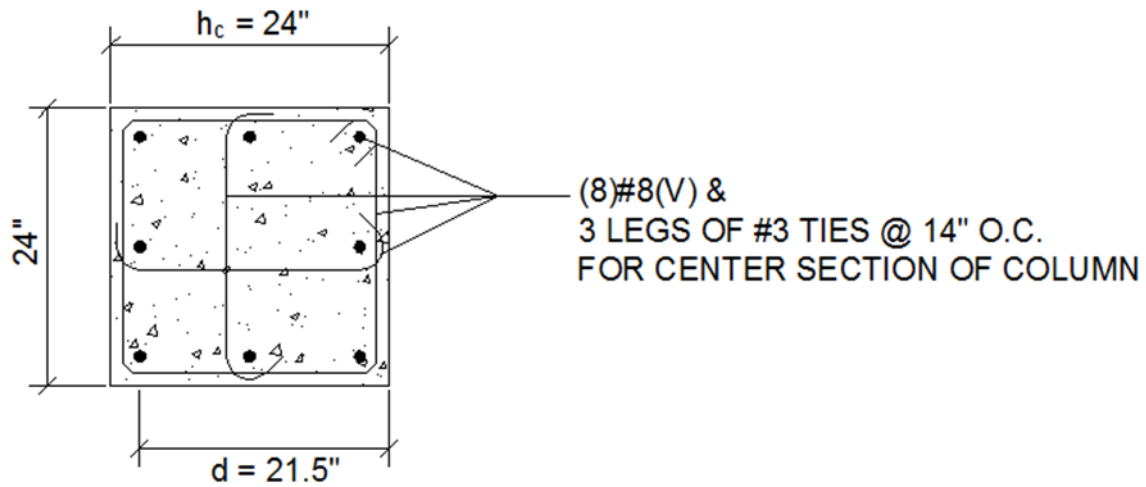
Interior column, center section cross-section for column at all floor levels based on SDC D design.
